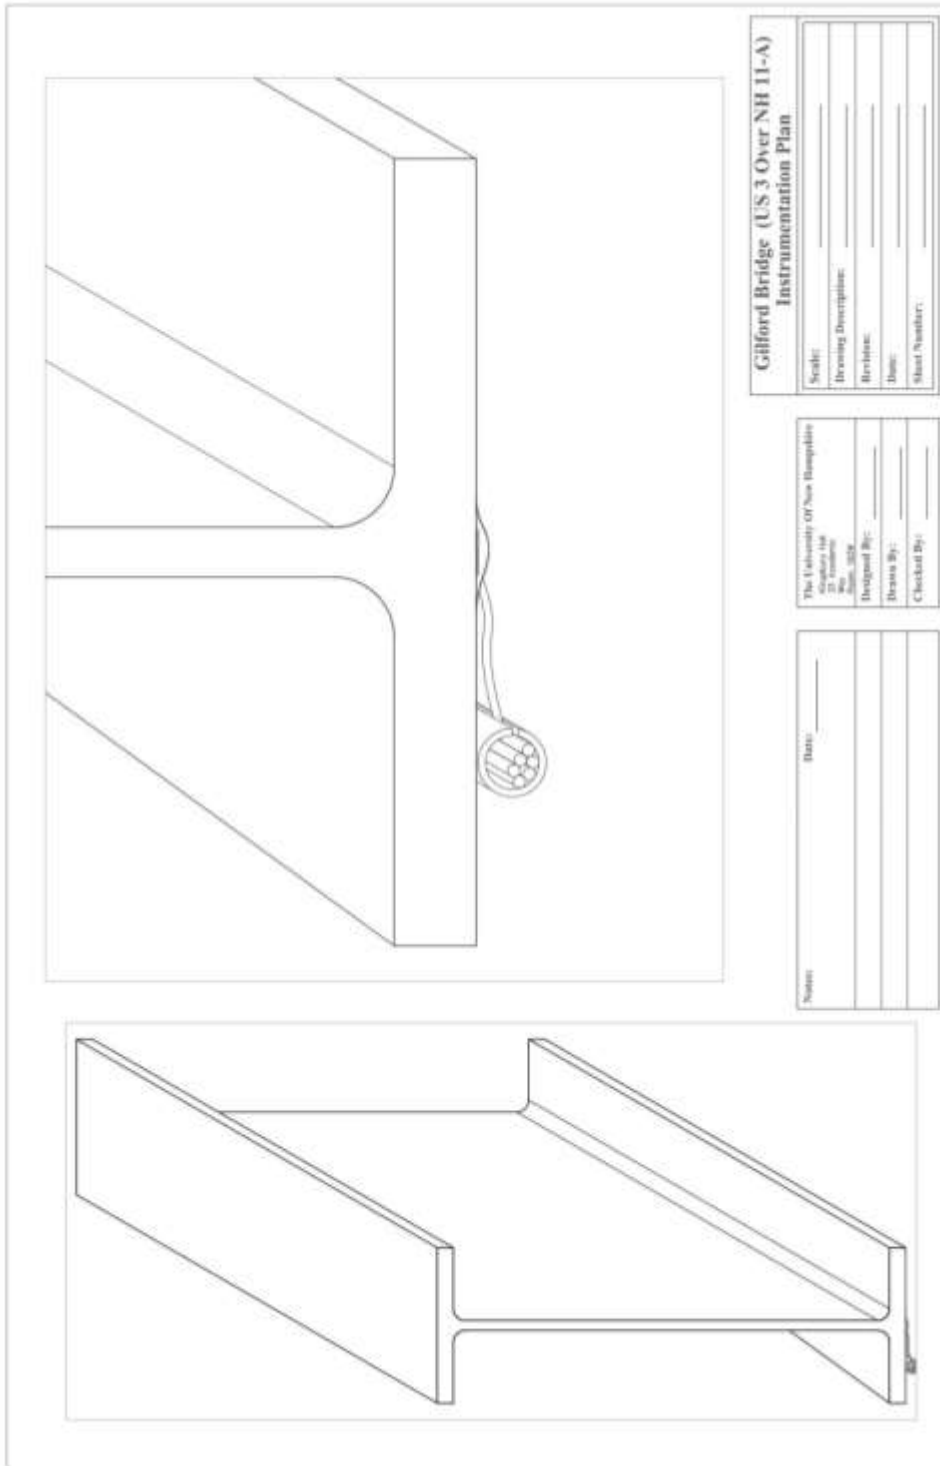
Gilford Bridge – Drawing of Hard Conduit Options Displayed on Structural Steel Bridge Section
